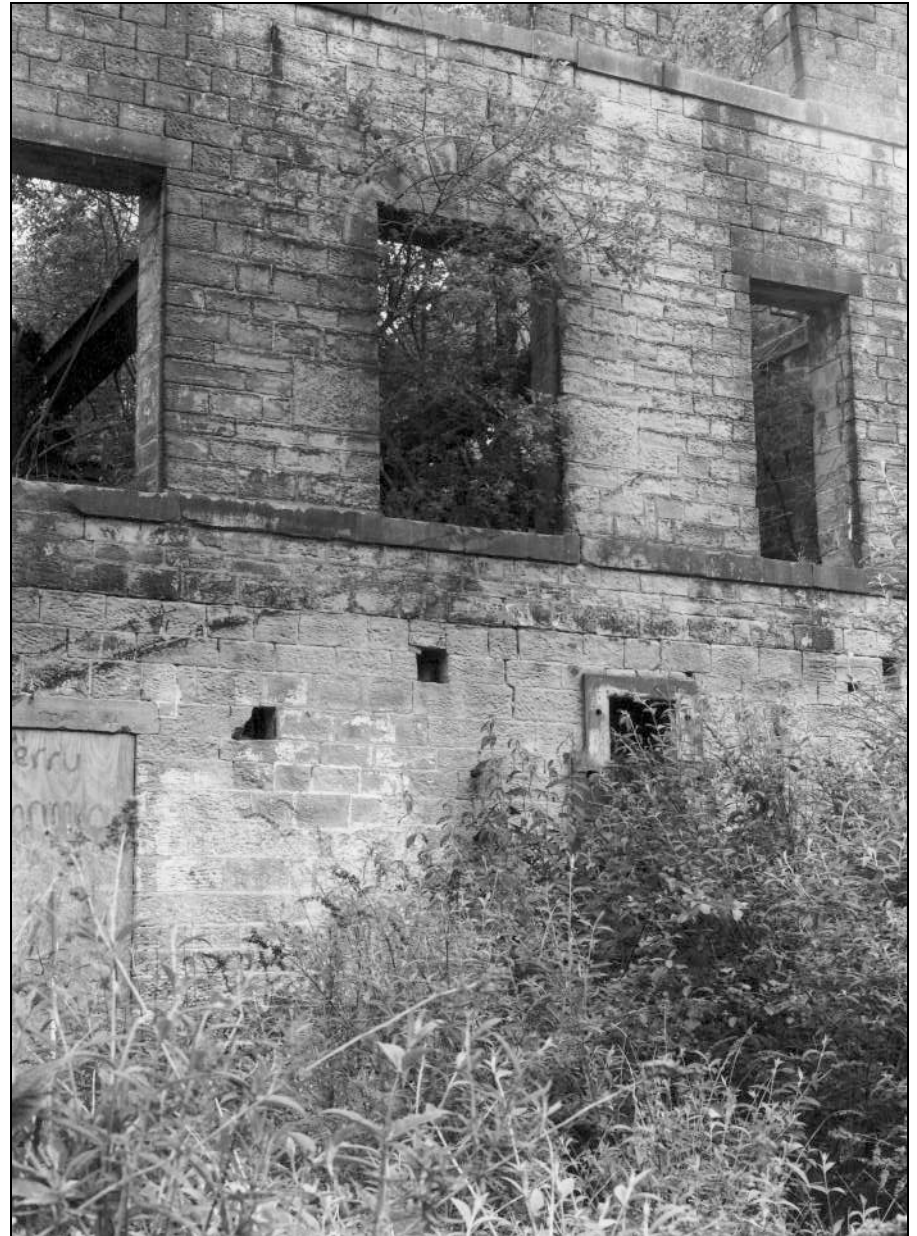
Spinning mill: window to former vertical engine room, south elevation (film 3, frame 6)
